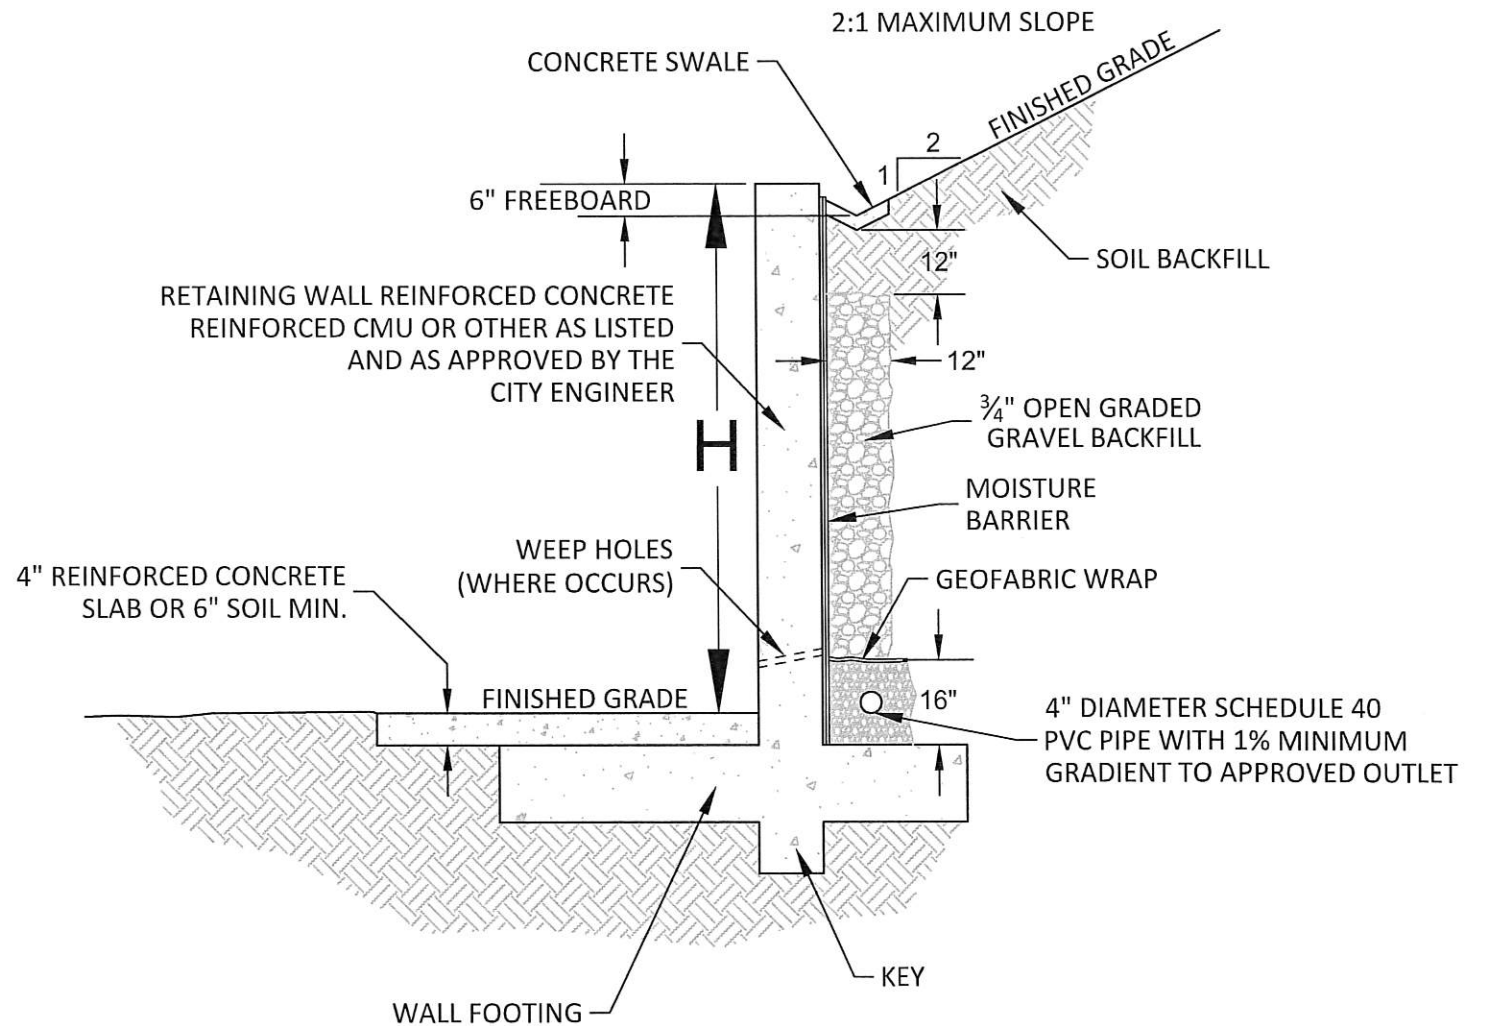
TYPICAL RETAINING WALL REQUIRED FEATURES
